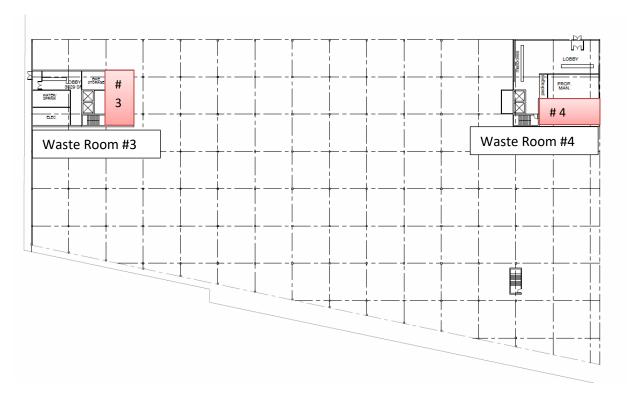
SOUTH BUILDING WASTE COMPACTOR ROOMS
